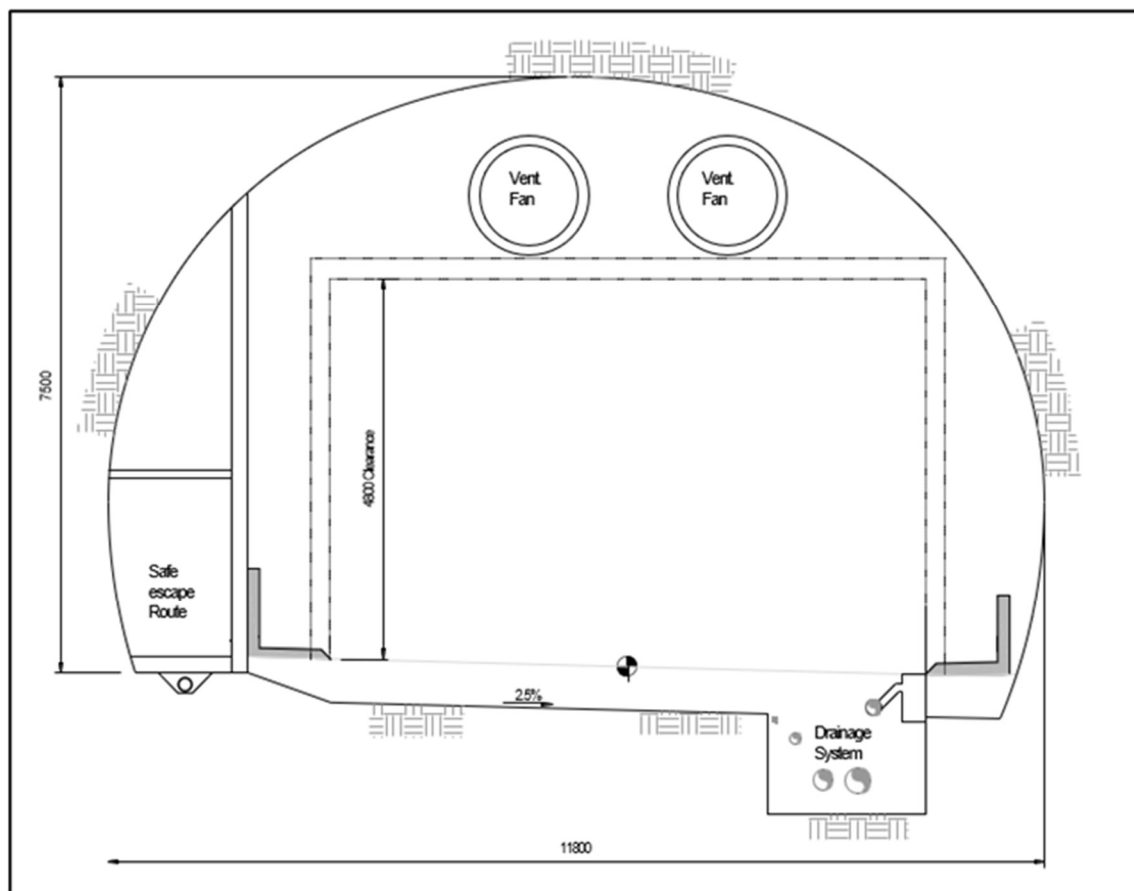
Typical tunnel cross-section with roadway, drainage, safety barrier and protected escape route
